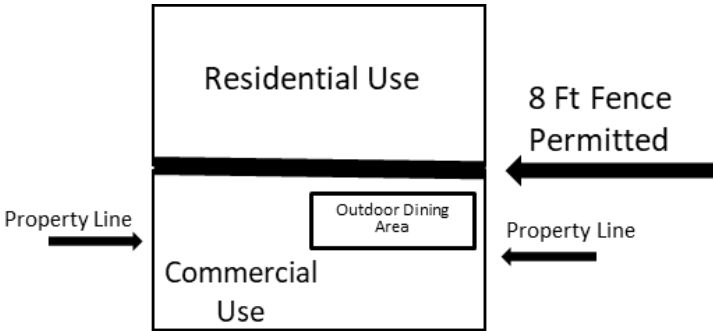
Location of 8-foot landscaped buffer, wall or fence.
